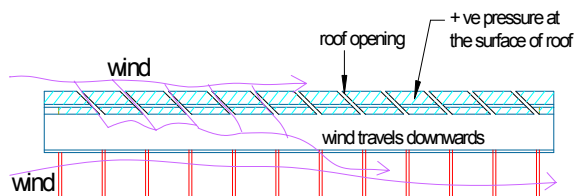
Sectional view of Roof type-2 which shows the distribution of wind into the inner space through the roof openings
